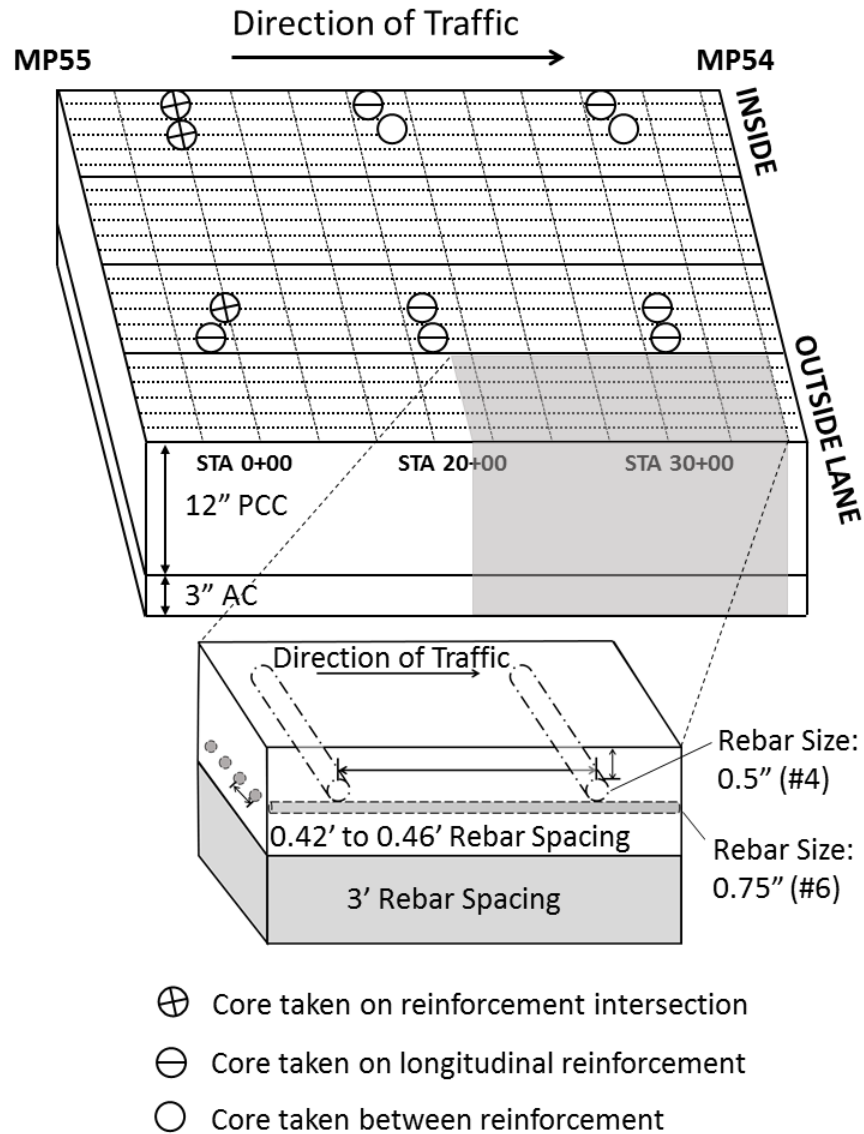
3D View of Pavement Design Parameters for Poor CRC (I-85 MP 55-54)
